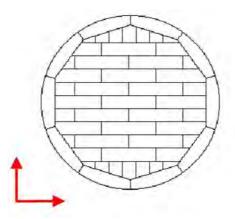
Position of tank datum into the bottom left-hand corner
